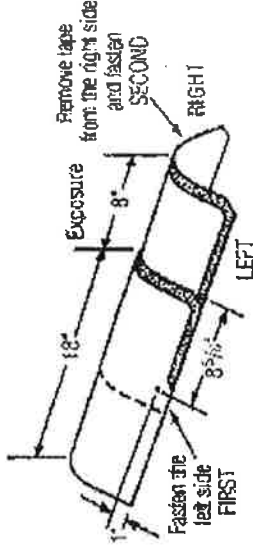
Installation of Shingle® Ridge shingles on hips and ridges.
